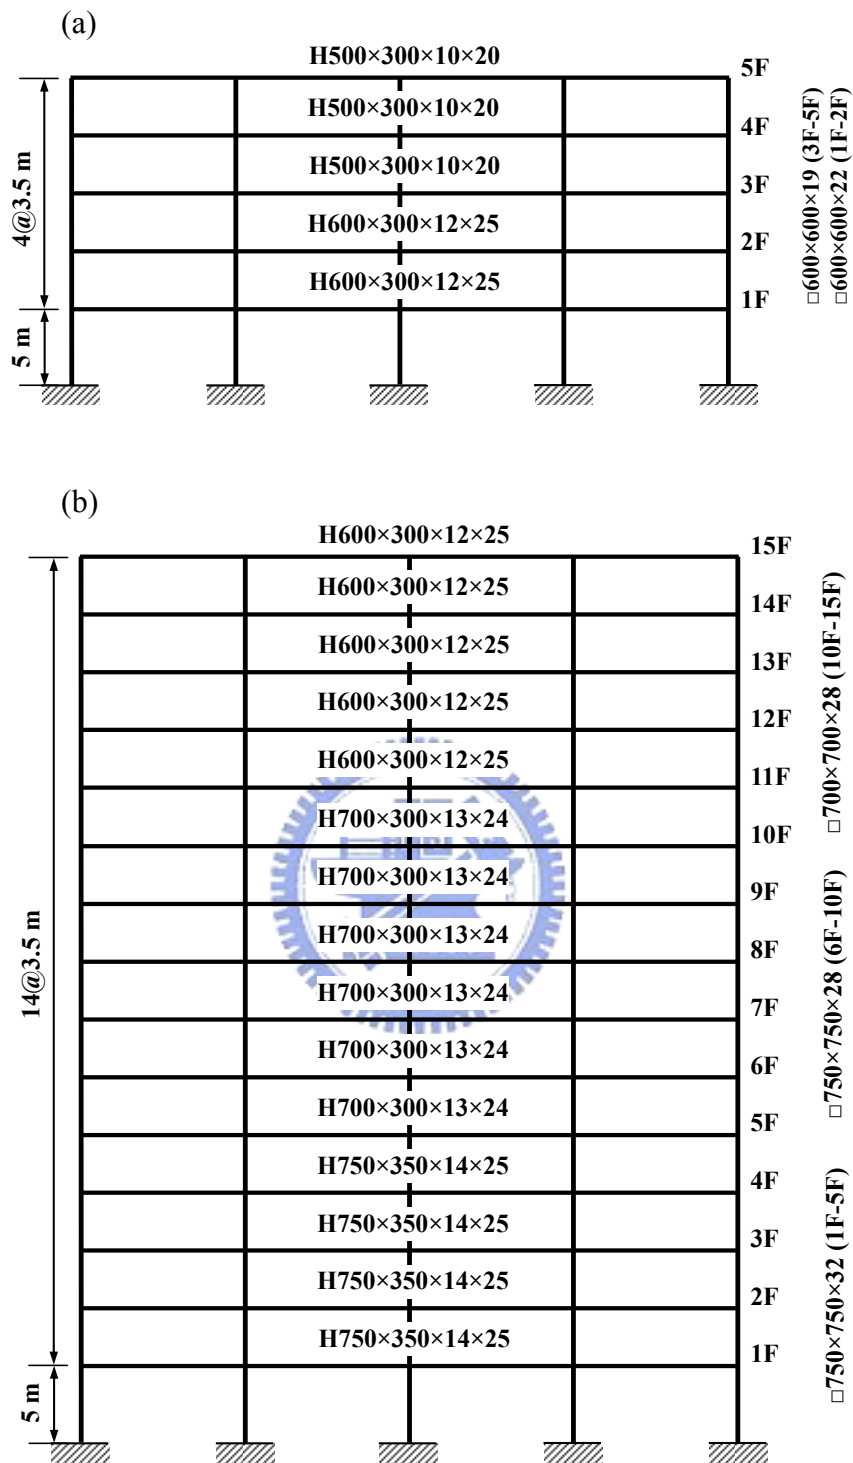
Design details of prototype buildings: (a) five-story frame; (b) fifteen-story frame.
